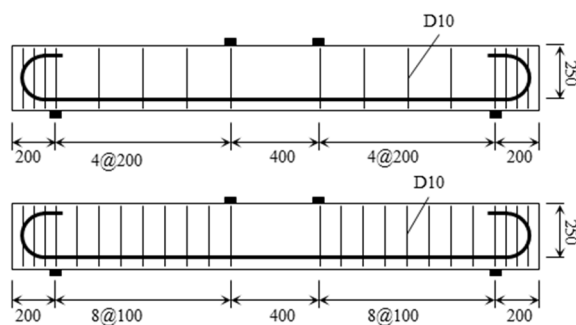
shows an overview of the RC beams. The specimens are designed as single reinforcement RC beam with a reinforcement ratio of 2.32 in which three D22s are placed at a position with an effective depth of 250 mm and width of 200 mm. Specimens with a shear-span length of 800 mm (shear span to effective depth ratio, a/d is 3.2) is used as the basic specimen, and the influence of differences in the material age and testing institution is investigated. Furthermore, we investigate the influence of a/d in two cases in which the loading point position is changed (a/d of 2.4 and 4.0), and the influence of the amount of shear reinforcement in two cases in which the closed stirrup of D10 is arranged as the shear reinforcement (shear reinforcement ratio of 0.36 and 0.72).
